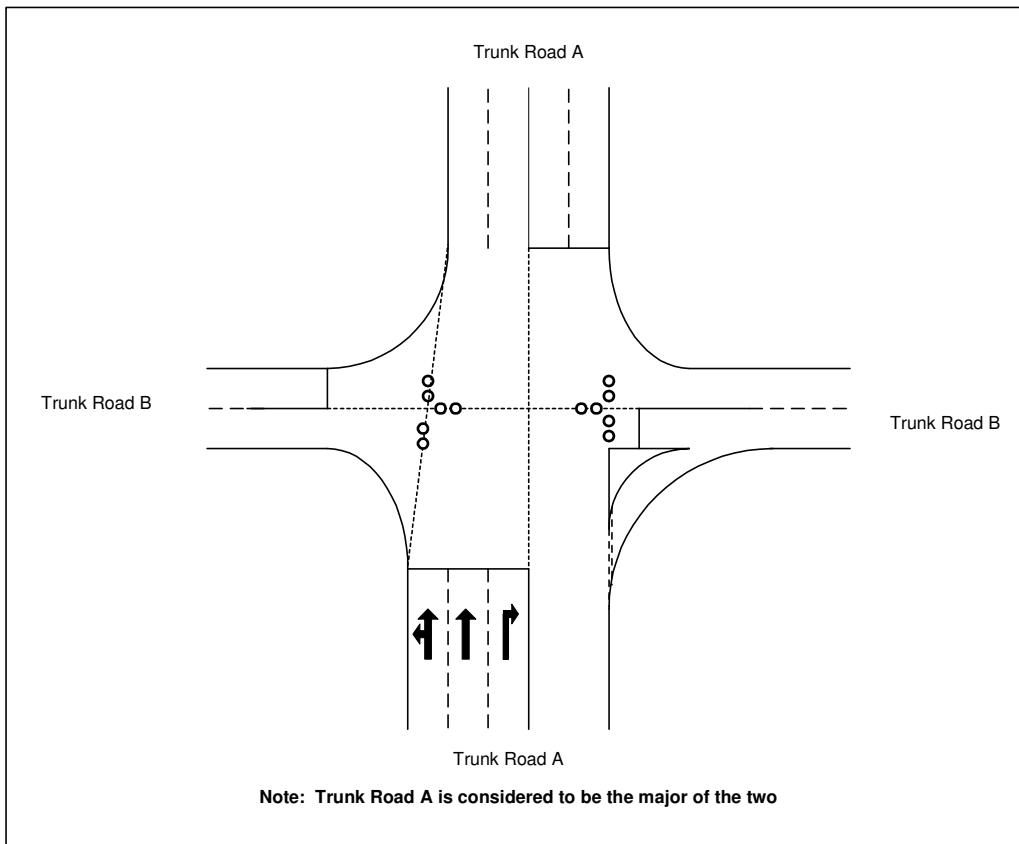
Trunk Roads meeting at a Cross Roads
